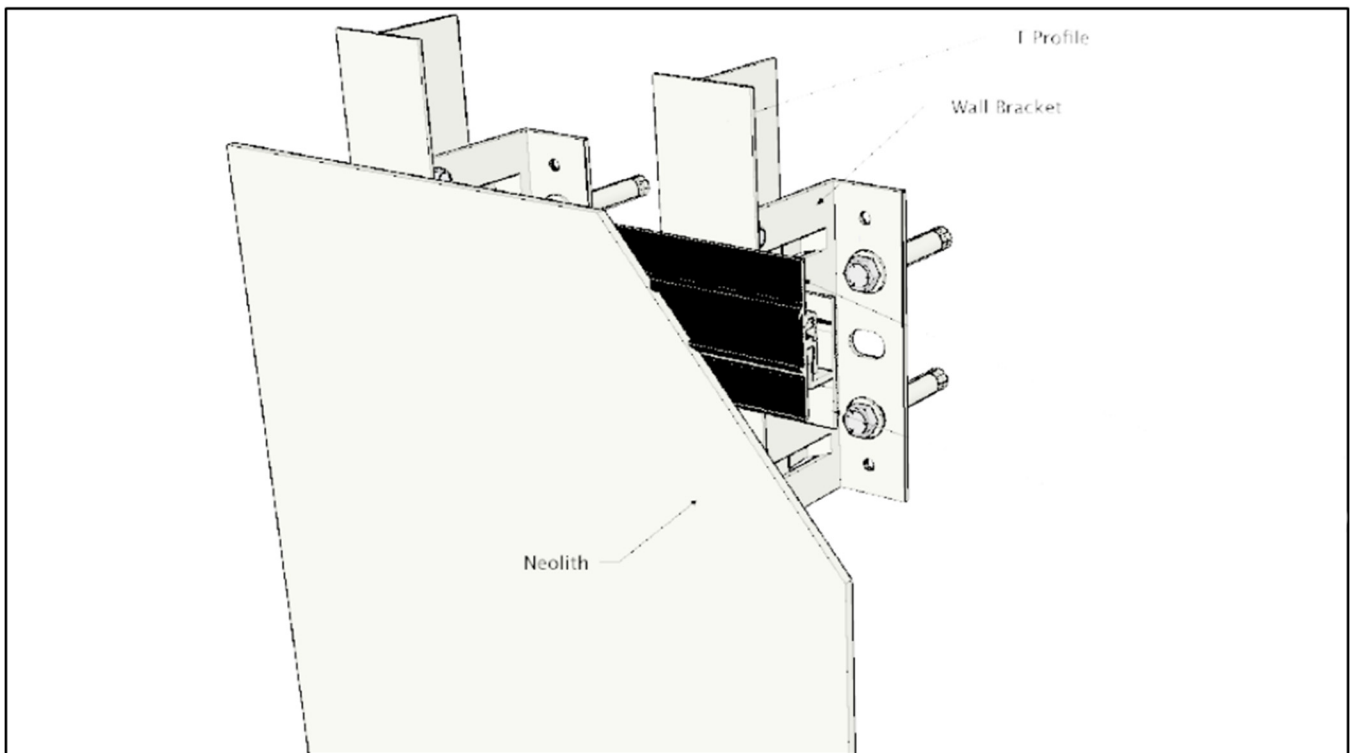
FRONT VIEW OF SYSTEM ASSEMBLY
